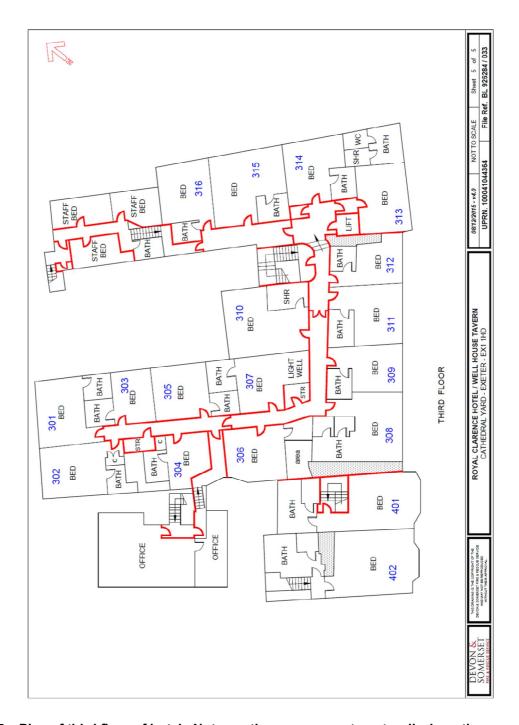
Plan of third floor of hotel. Note continuous compartment wall where there was a party wall between the medieval houses (separating rooms 401 and 402 from remainder of the hotel)
